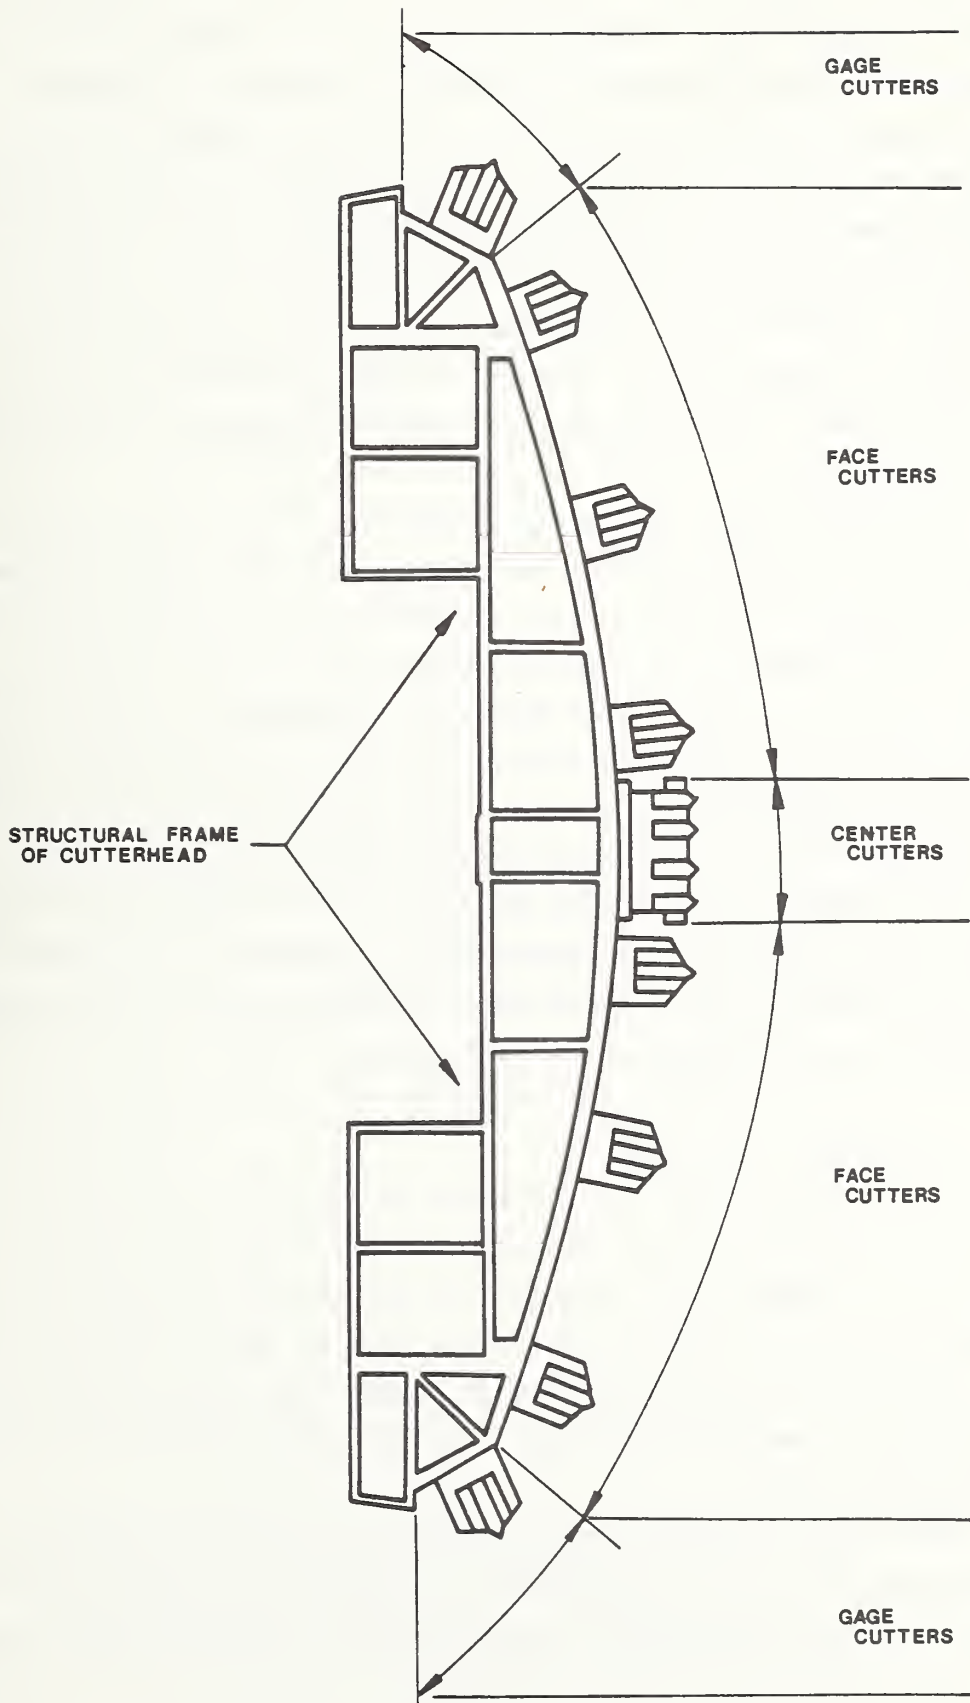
PROFILE VIEW OF TYPICAL ROBBINS CUTTERHEAD
